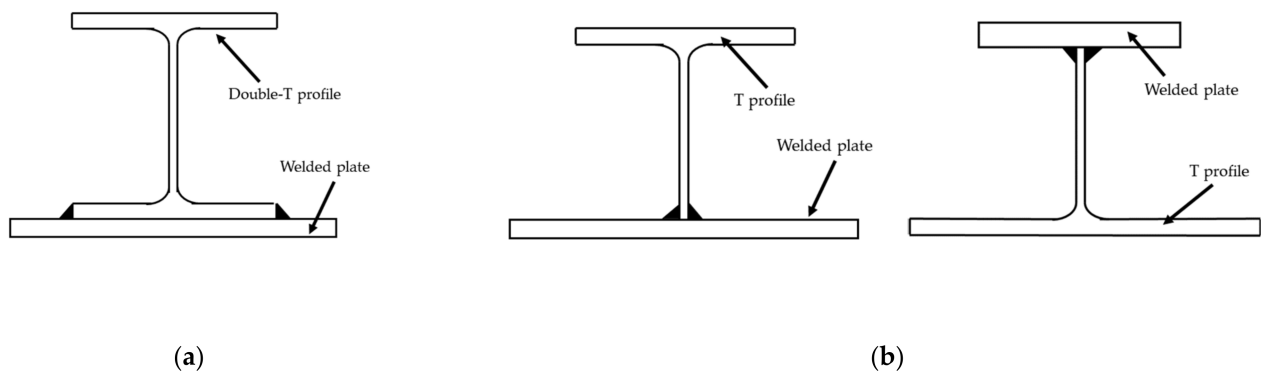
Asymmetrical slim floor beam: (a) with a wider plate welded below the bottom flange slim floor beam (SFB); (b) with a wider bottom flange integrated floor beam (IFB) [7].
